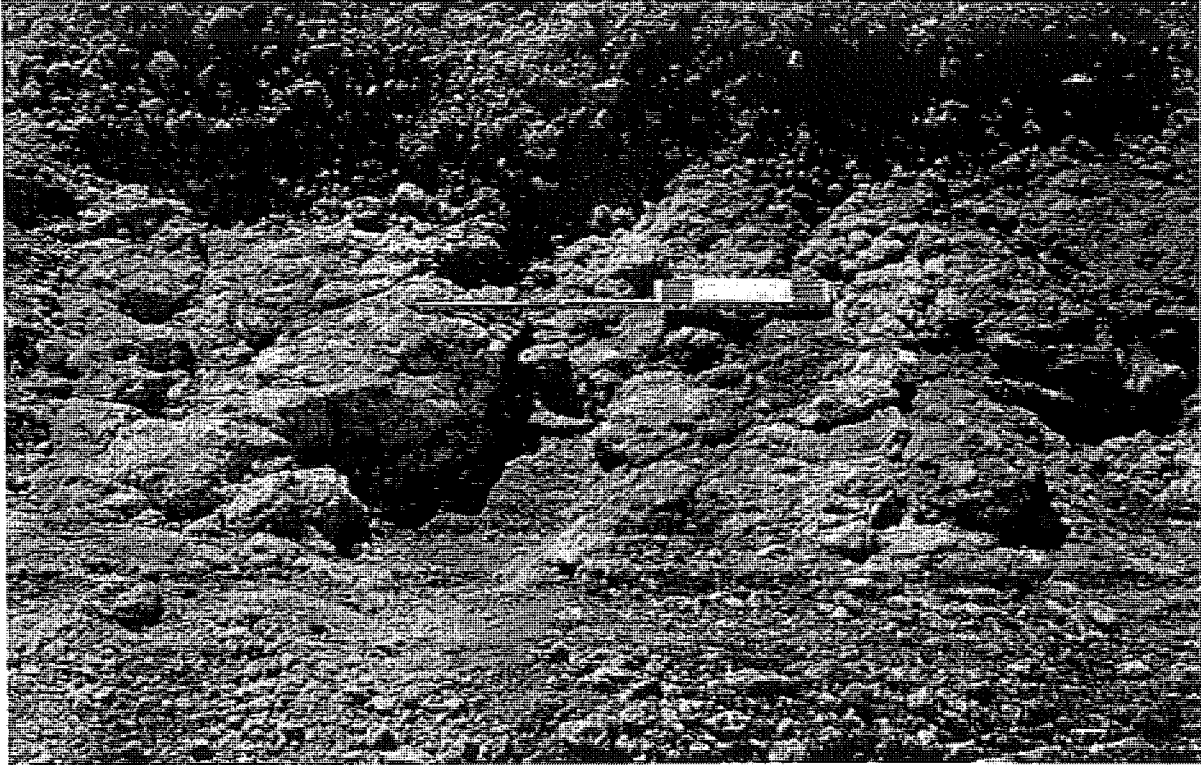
Portage Road NBIL (Portage) trench in rubblized concrete (station 3+609)
